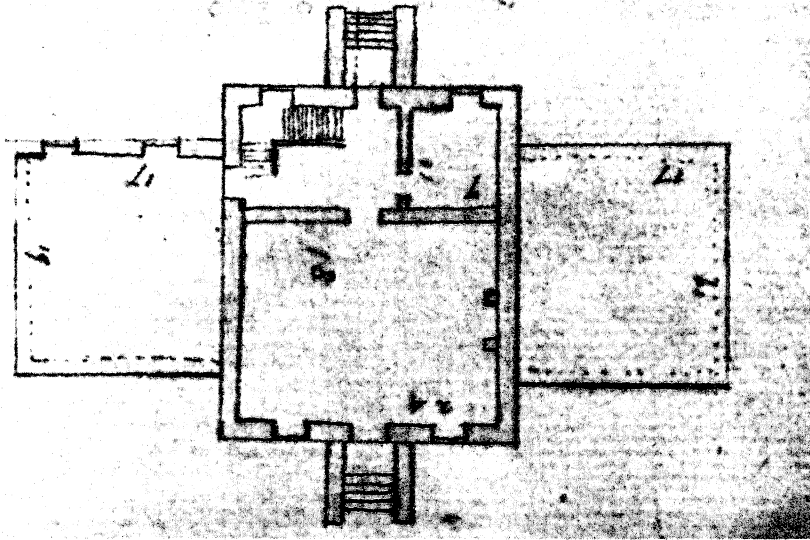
PLAN OF A HOUSE, CLOSELY RESEMBLING
